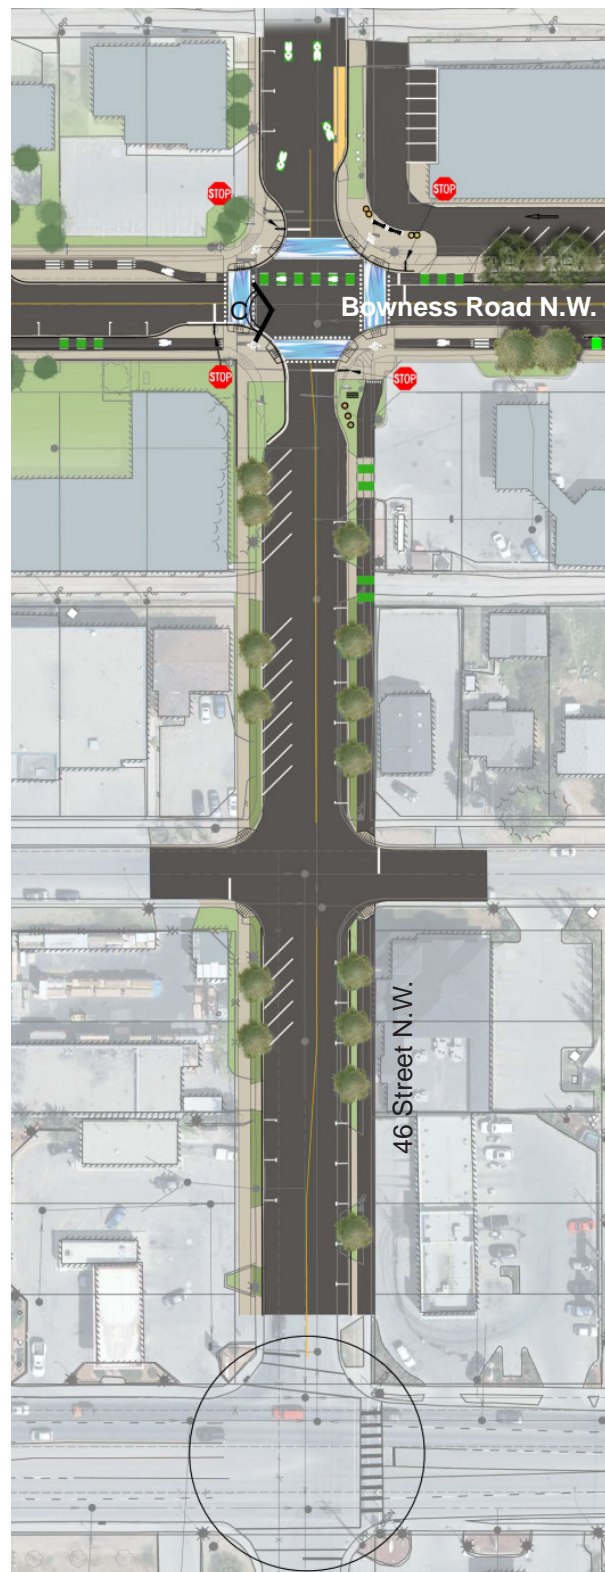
46 STREET N.W. DESIGN CONCEPT PLAN
